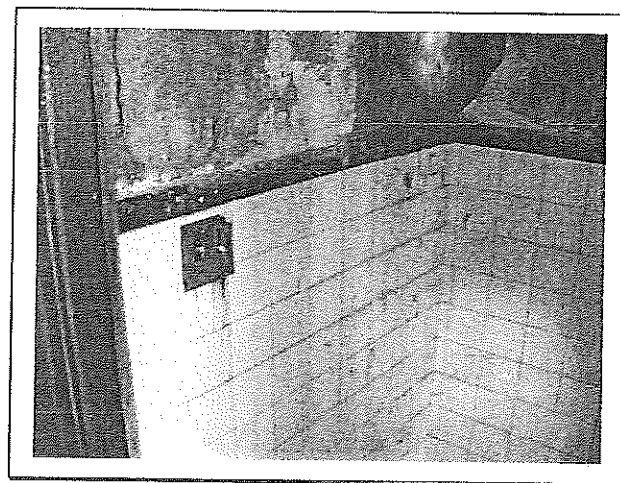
Viewing yellow 4" wall tile and black tile trim, 1st and 2nd floor – Men's restroom.
